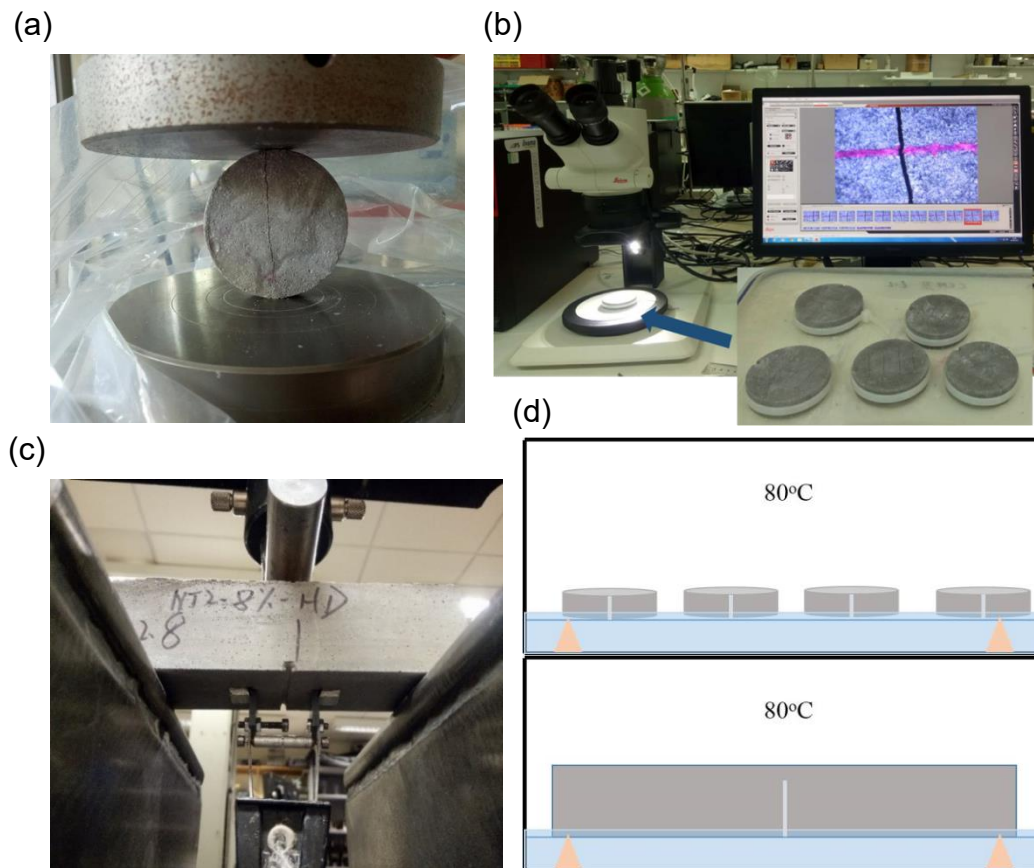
(a) Cylindrical disk cracked using the 50 kN CONTROLS UNIFRAME testing machine; (b) Two parts of the cracked disk were glued together at the ends and fixed with a flexible cable tie with a controlled crack width with of 150-200 μm under a microscope; (c) Prismatic samples cracked using three-point bending test; (d) Curing condition of the cracked disks at 80 °C.
